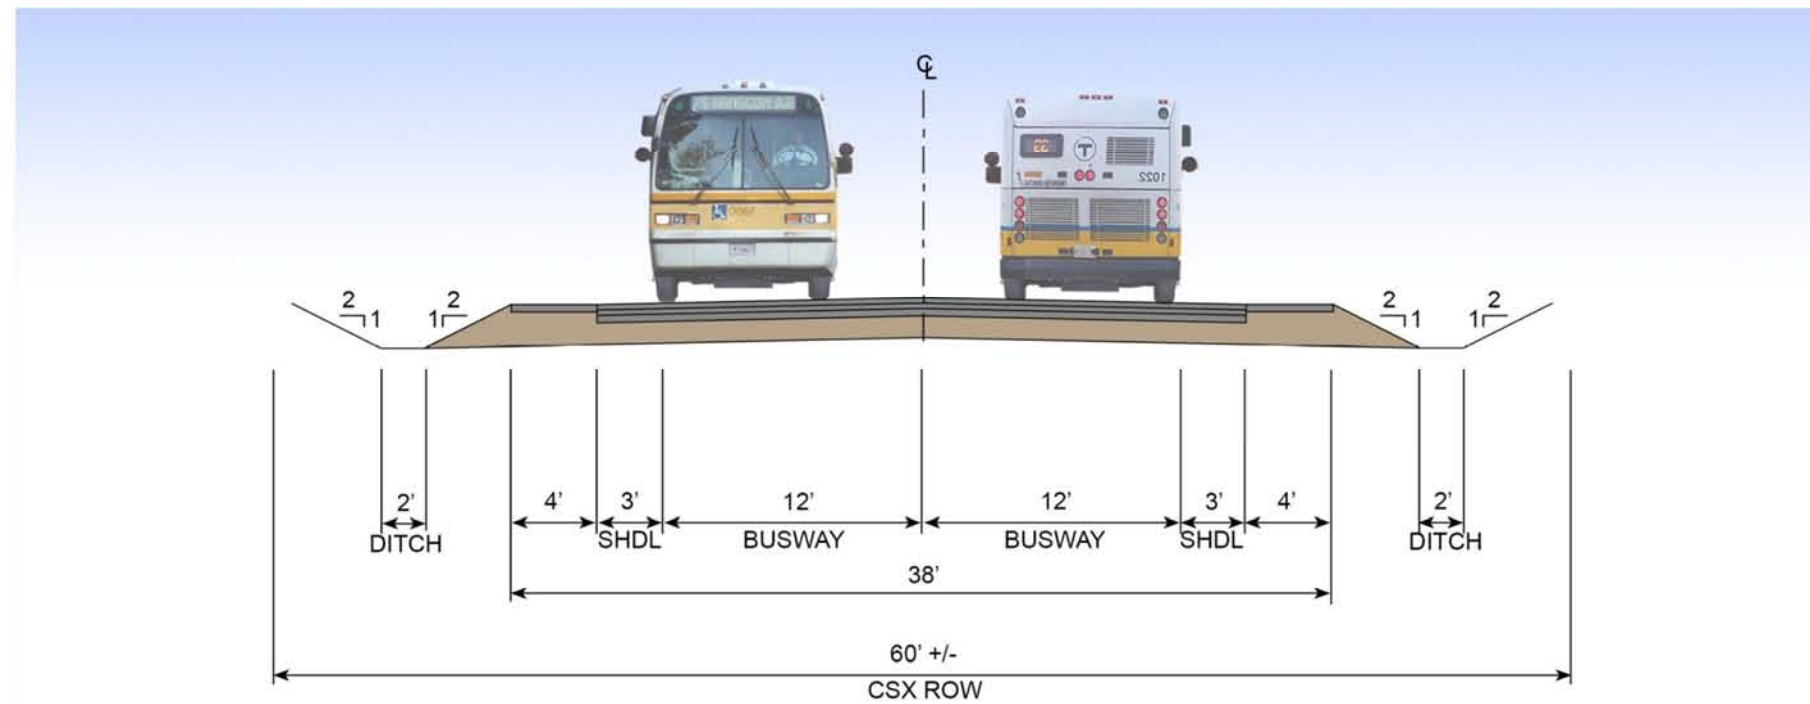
Urban Ring BRT – Typical Section (Griffin Way to Broadway)
